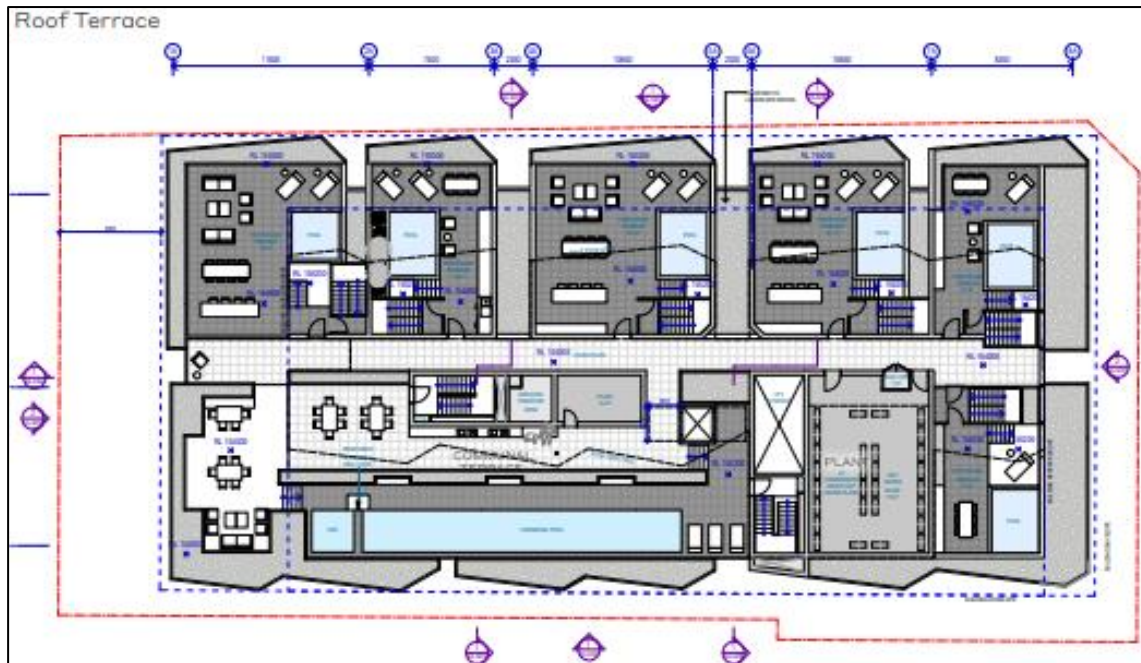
Roof Terrace (Source: Woods Bagot, 2024)
